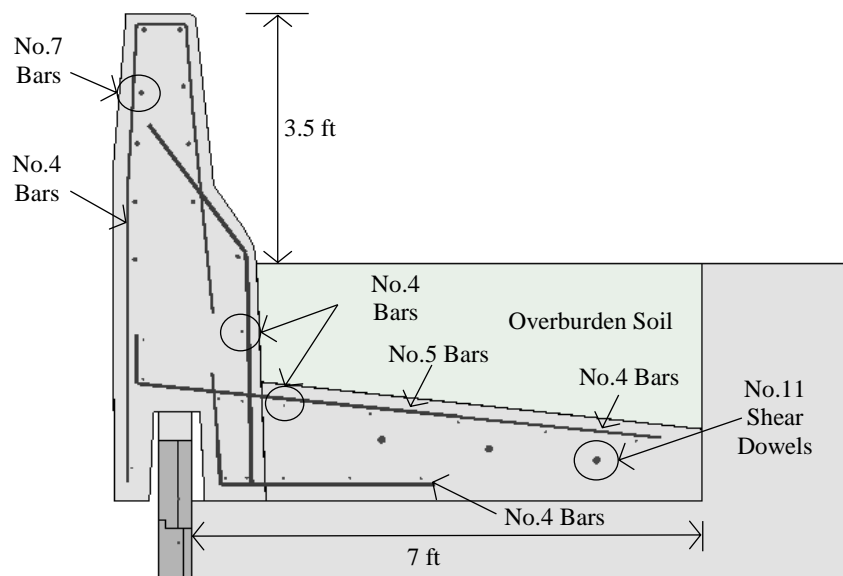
TL-5 barrier-moment slab system model of the TL-5 test installation
